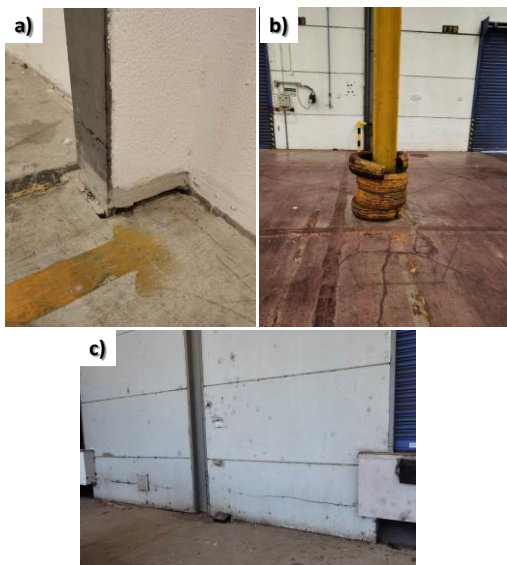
Main pathologies. a) differential settlements between the pavement and the facade, b) degradation of the pavement around a pile cap, c) cracking in the east side of the warehouse.
